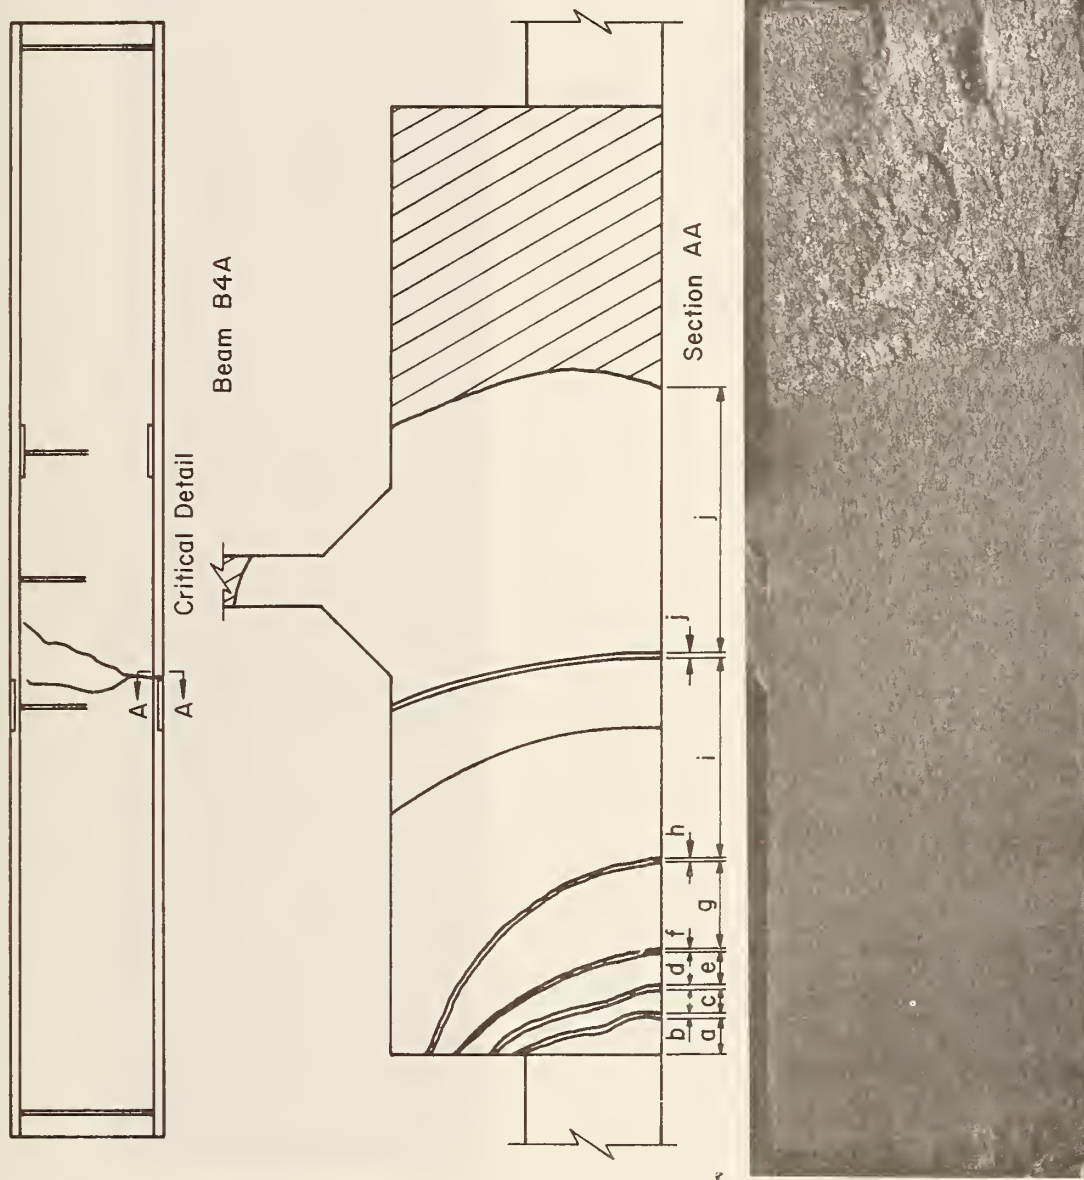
Fatigue and Fracture Surface, B4A (A36)
